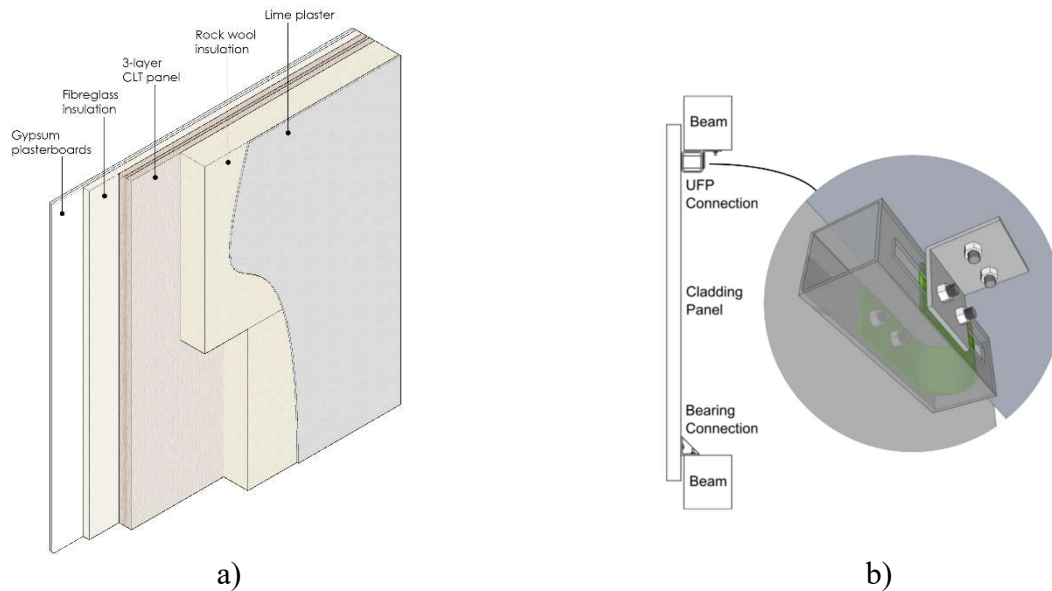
a) Detail of the facade in the longitudinal direction; b) Cladding system with low-damage UFP connection [58].
